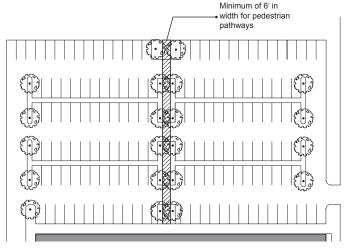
(2). Parking Lot Pedestrian Walkway.
